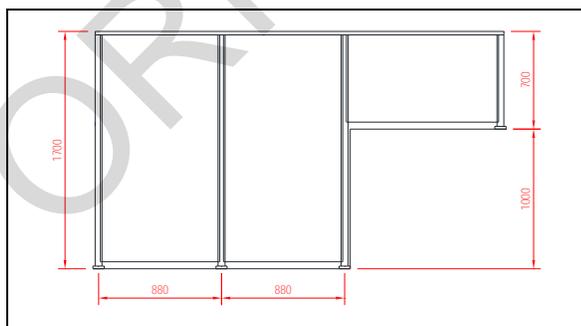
TYPICAL B2 SCREEN SETOUT
